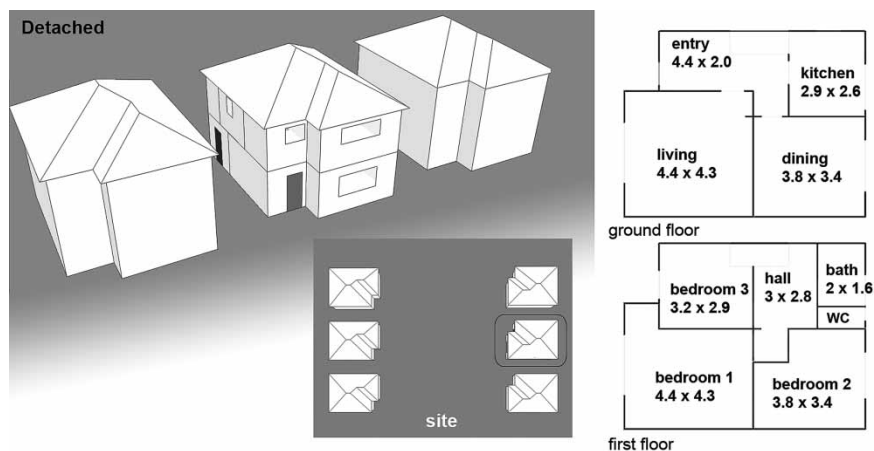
Perspective image, site plan and floor plans of the car suburb (CRS) detached home. Source: adapted from Allen & Pinney (1990)
